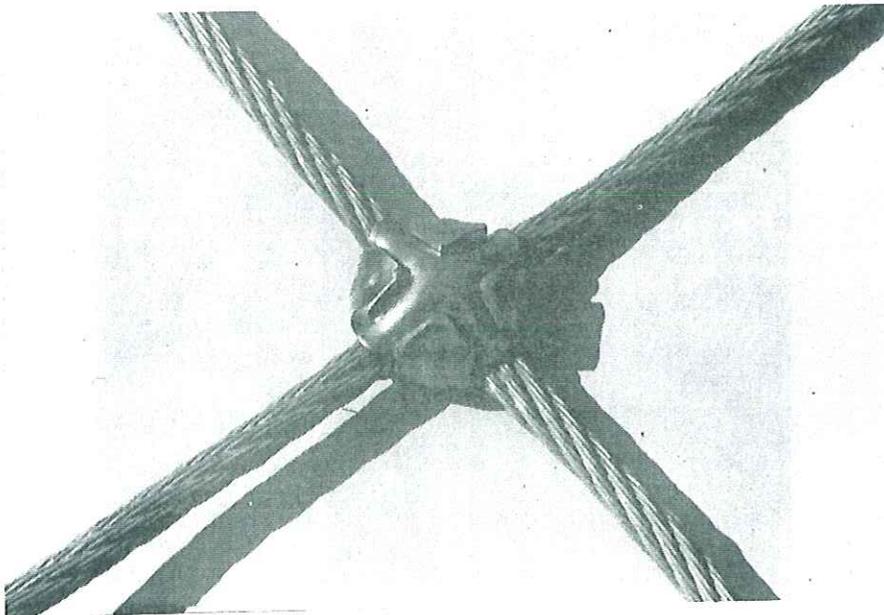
CLOSE-UP OF BRUGG MACHINE-CRIMPED NET FASTENER
